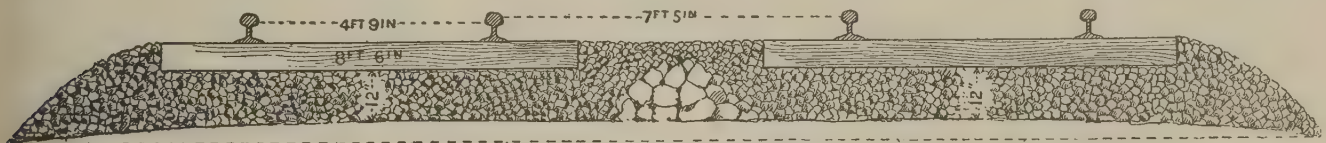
CROSS SECTION OF STEAM RAILWAY CONSTRUCTION WITH STONE BALLAST.
